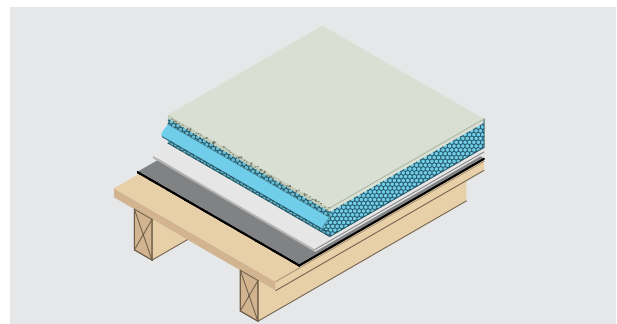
>> Inverted roof on light-weight deck with self-ballasted insulation
